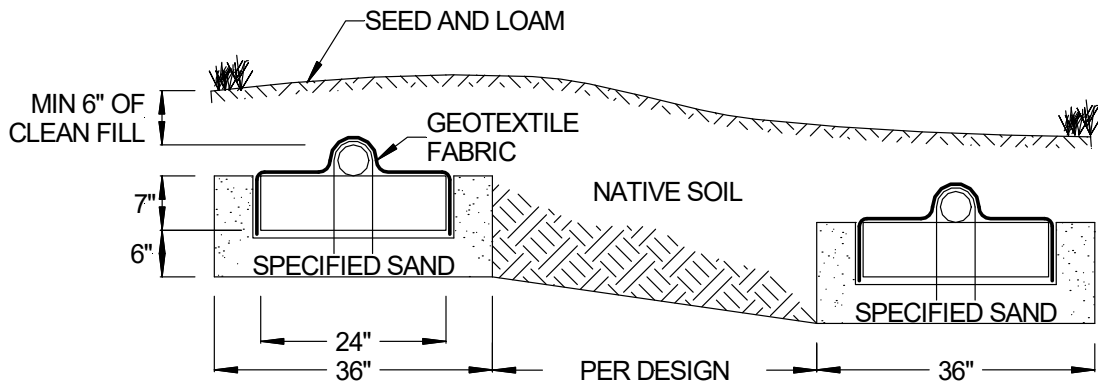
SECTION VIEW – A42 MODULES – TRENCH SYSTEM – SLOPING SITE
